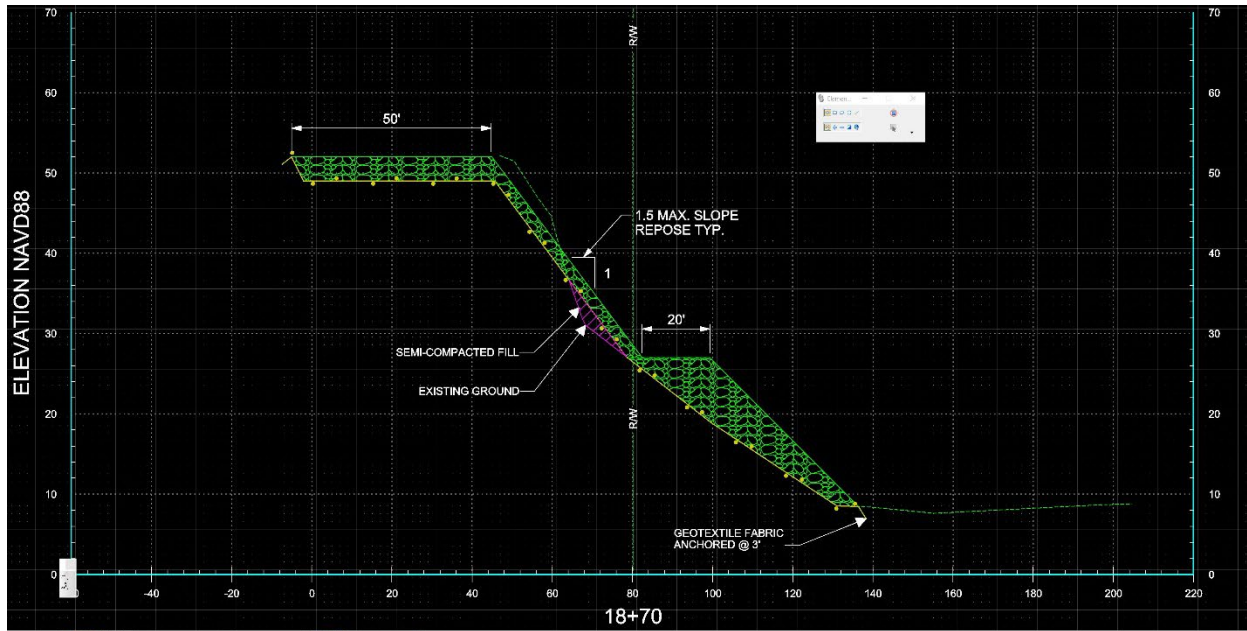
Alternative 5 Typical Cross-Section (Tieback)
